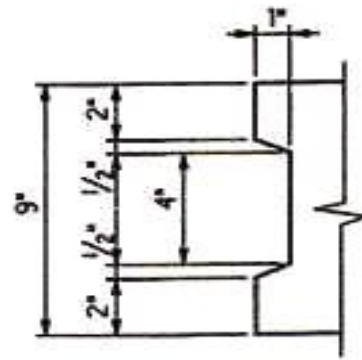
Details of Stage 3 of the precast panels
